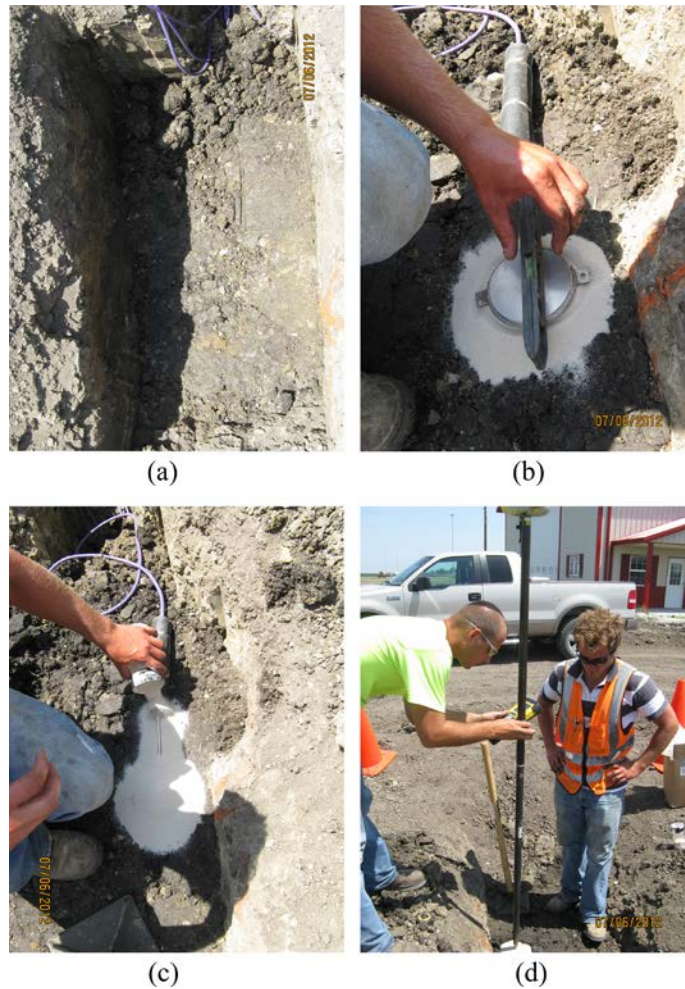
EPC installation on 6th St. South: (a) excavation; (b) level placement on top of silica sand; (c) backfilling with silica sand; and (d) measurement of actual elevation using RTK-GPS
